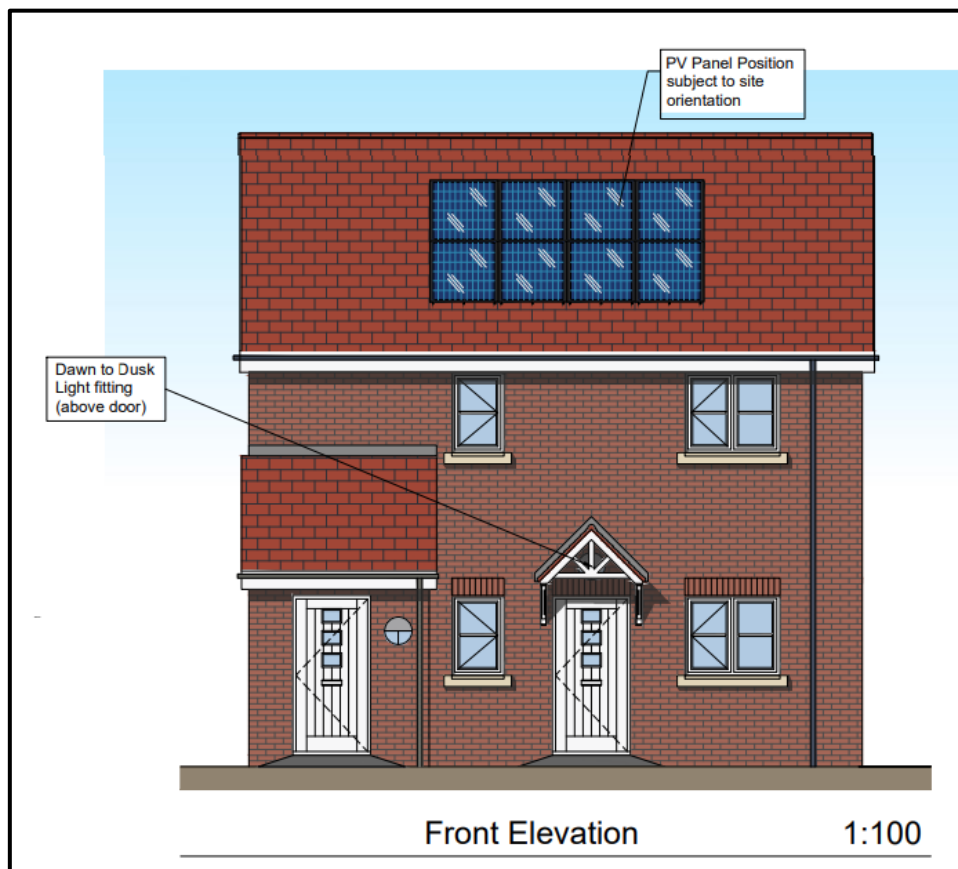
Typical 2p1b Detached Walk-up Flat with brick finish
